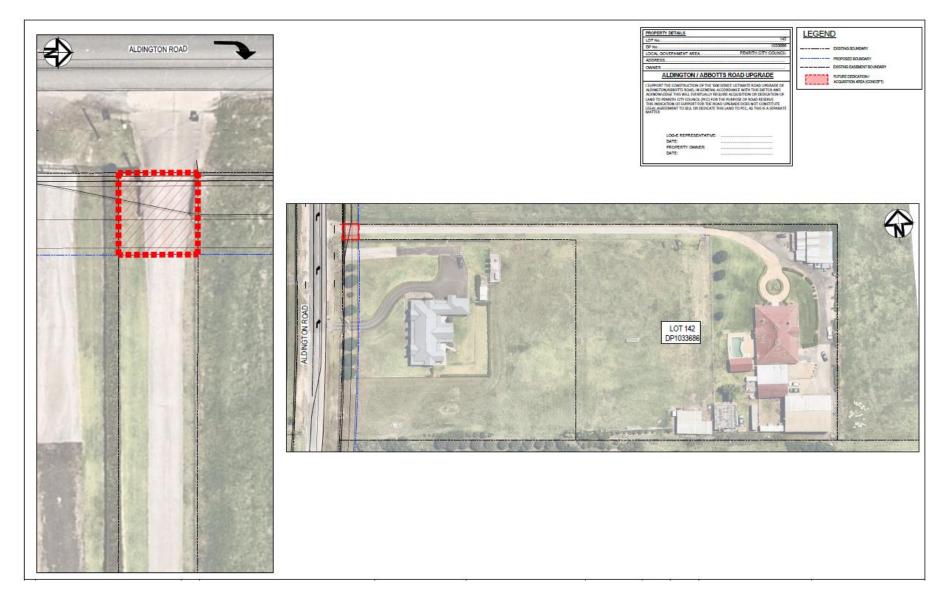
Proposed development on Aldington Road, within the curtilage of heritage item Brick Farmhouse (I4)
